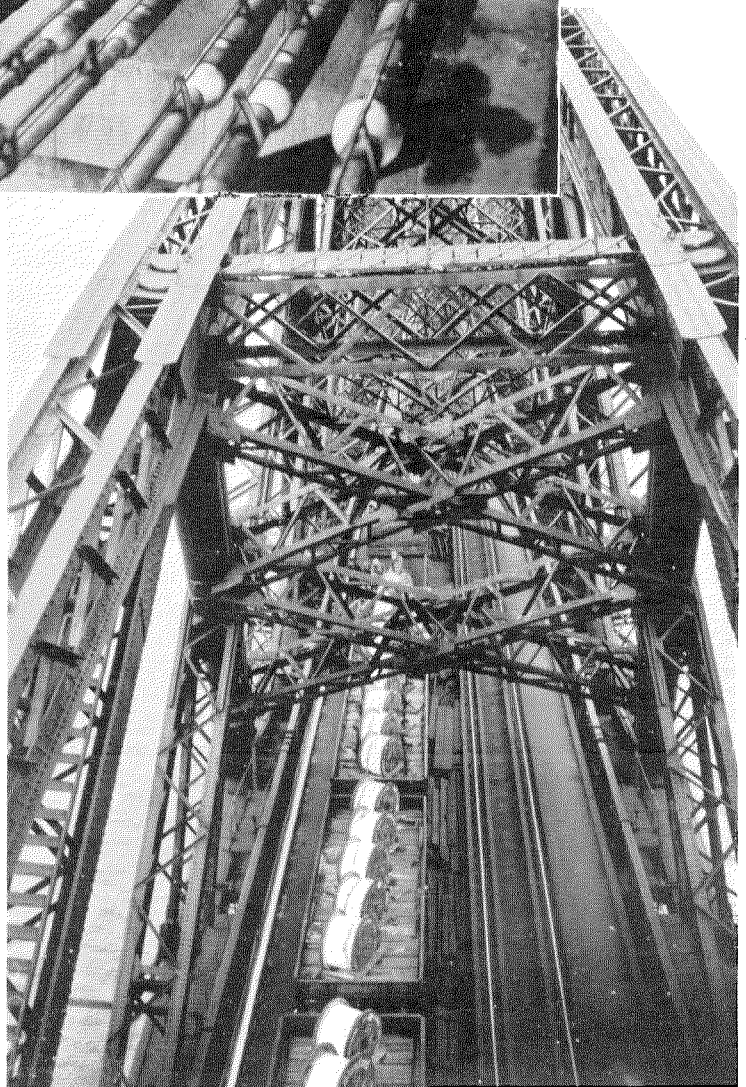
Forth Bridge — Laying cables from trucks (view taken from top of south pier).
